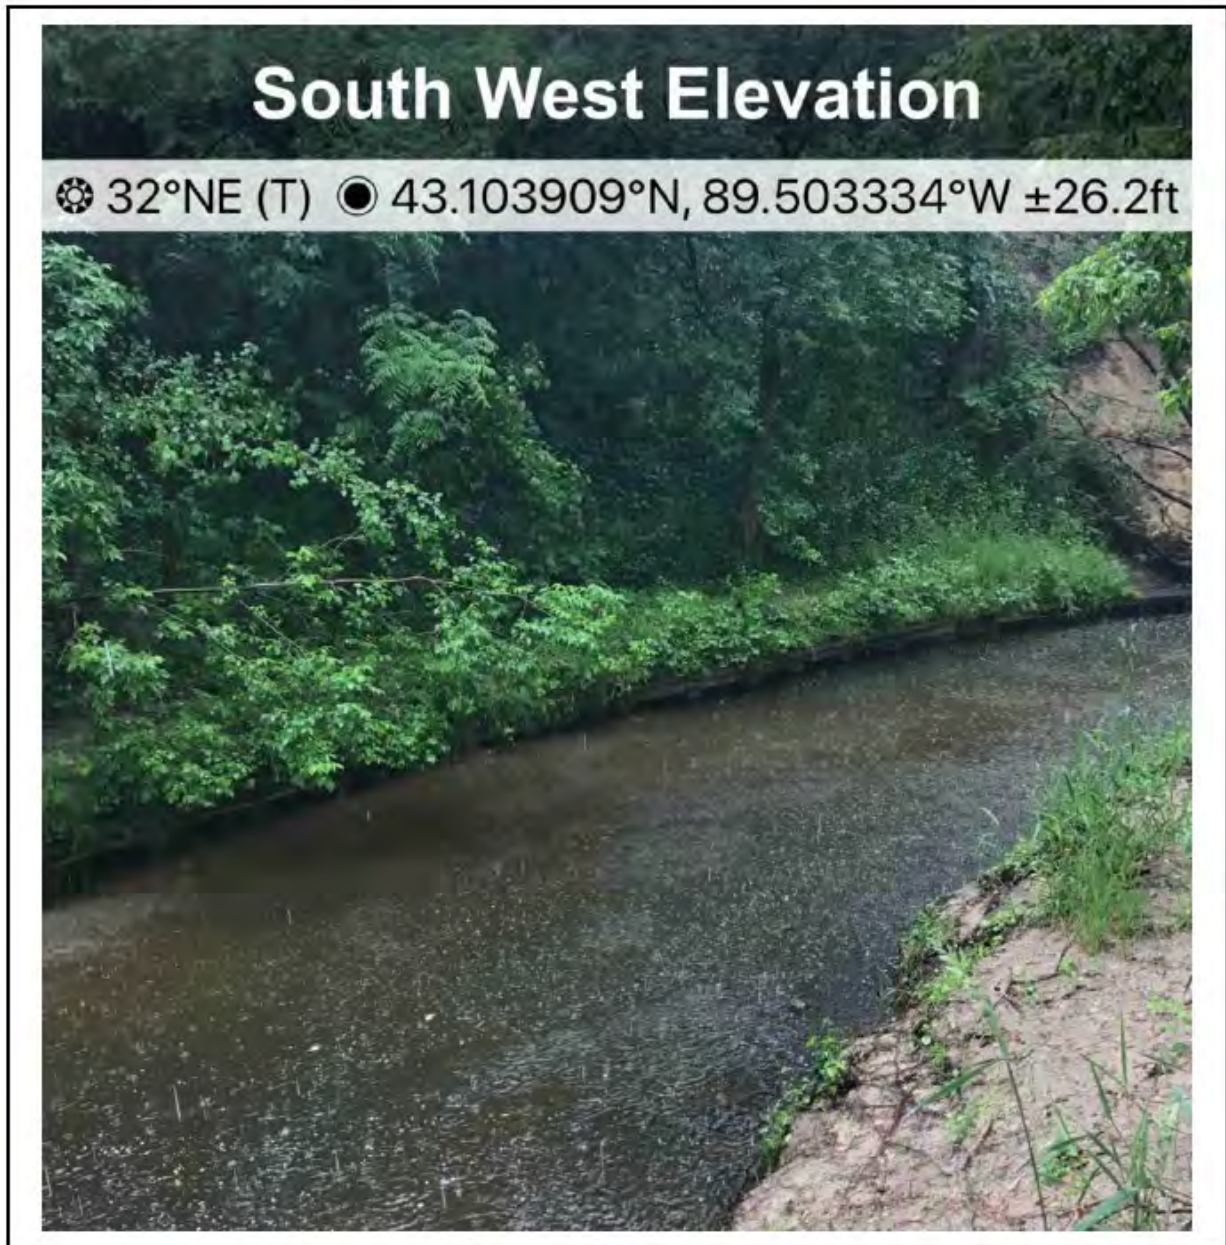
Site 15 (May 2019) taken at 43.103909, -89.503334. View of damaged sheetpile wall on north streambank.
